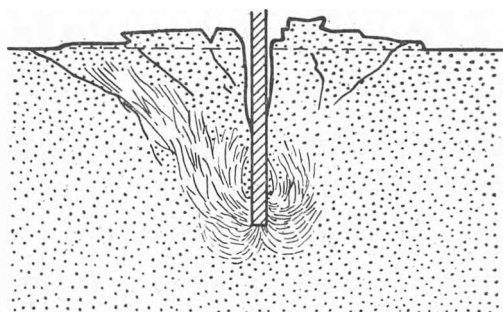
Heave of damp sand due to driving of model pile (after L'Herminier)
